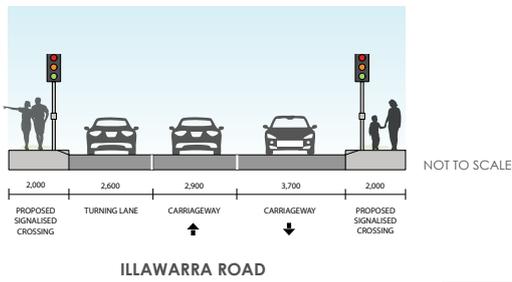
Section E-E: Route 2 | Illawarra Road at Petersham Road, looking north-east
